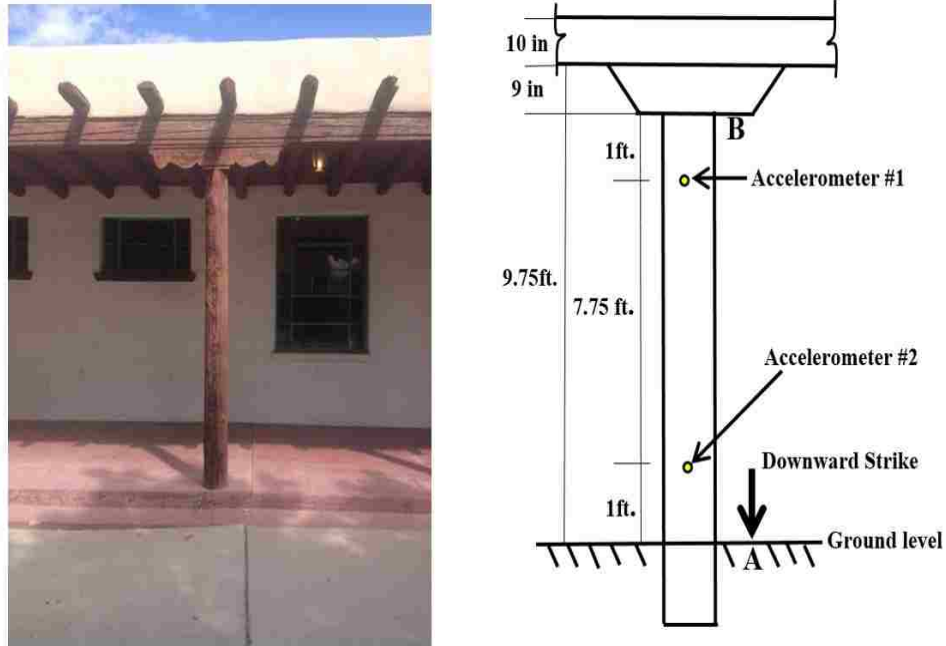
Biology Annex Building Wooden Column and SE Test Setup
